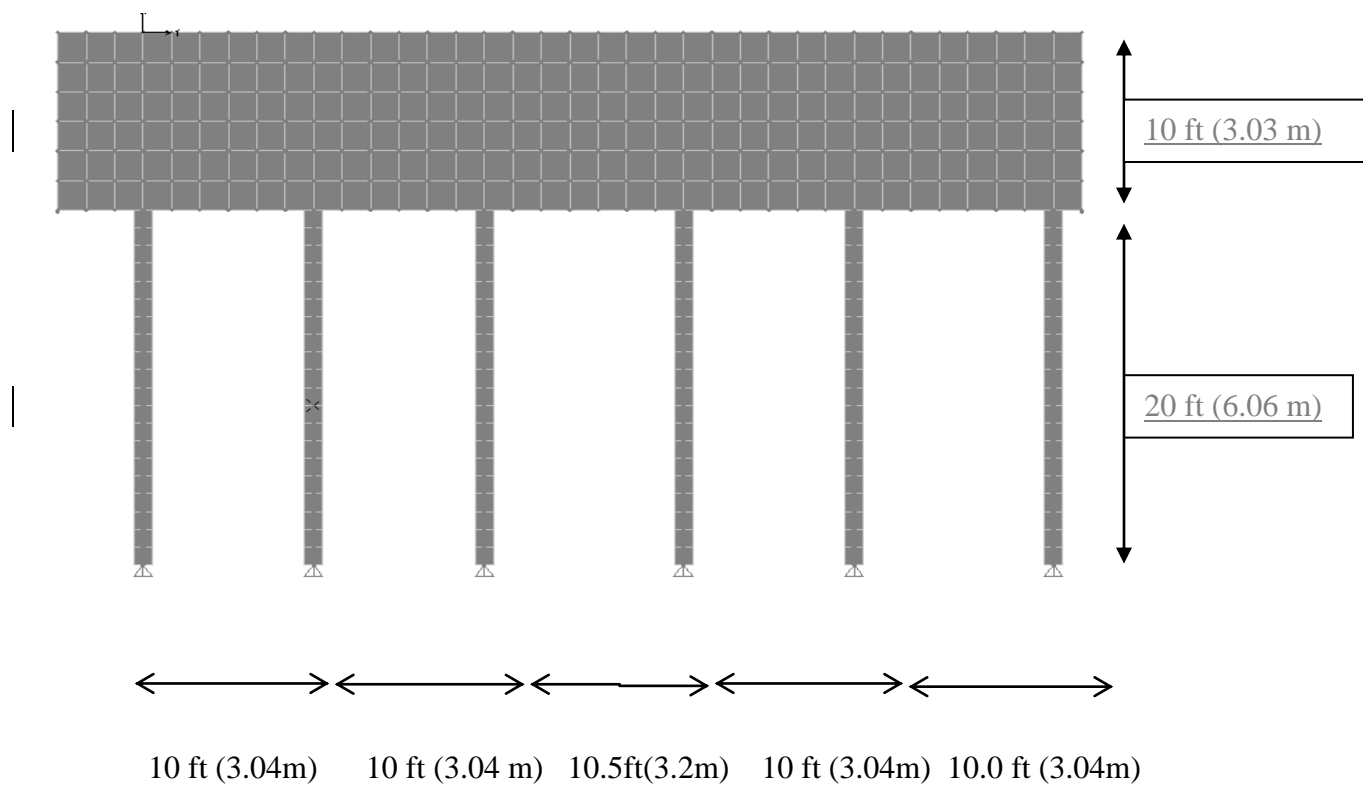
FEM Model For Integral Abutment Bridge (Side Elevation)
